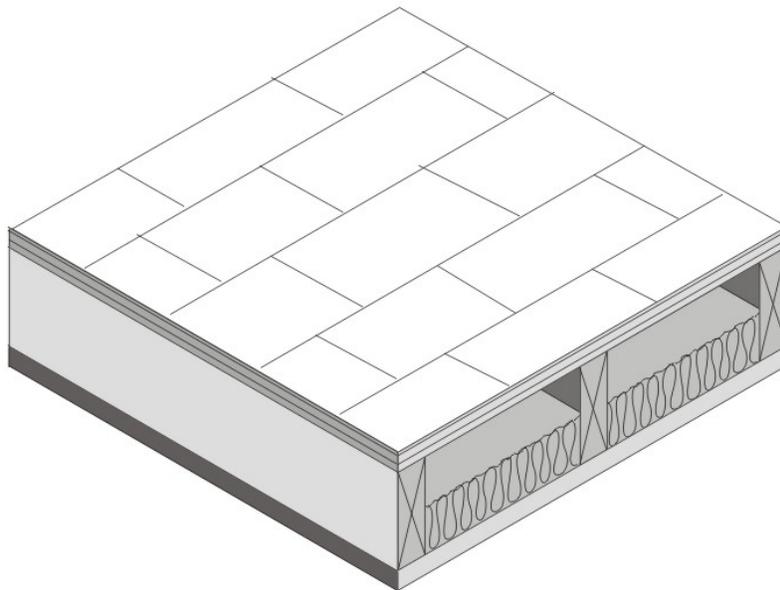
IV.2 – Wood Frame Rafter Roof
